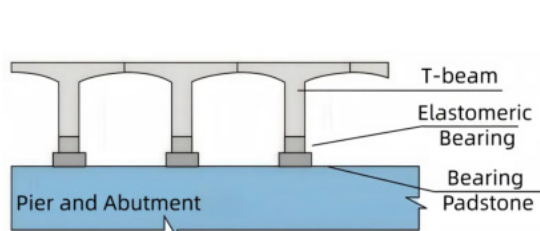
Bearing Padstone Arrangement for T-Beams
